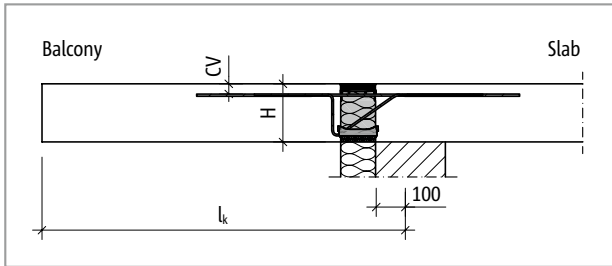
Schöck Isokorb® XT type K-M1 to M10: Static system
